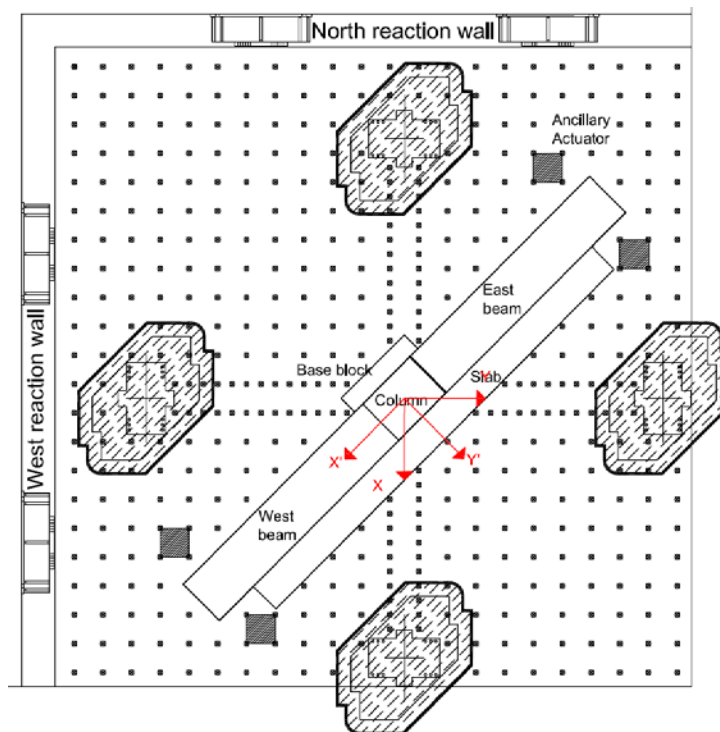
Cross section orientation of the slab-beam-column specimen
